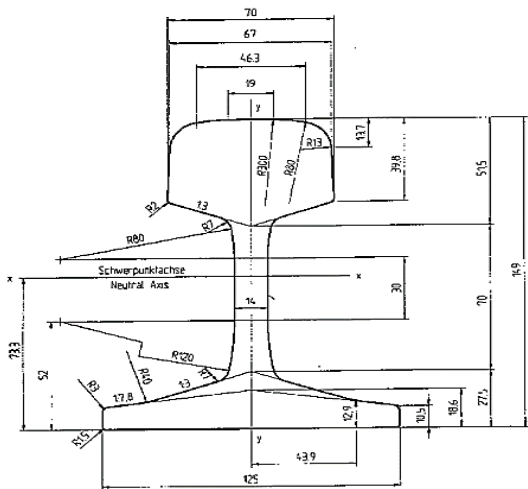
Geometry of UIC-60 rail [15] (dimensions in mm)
